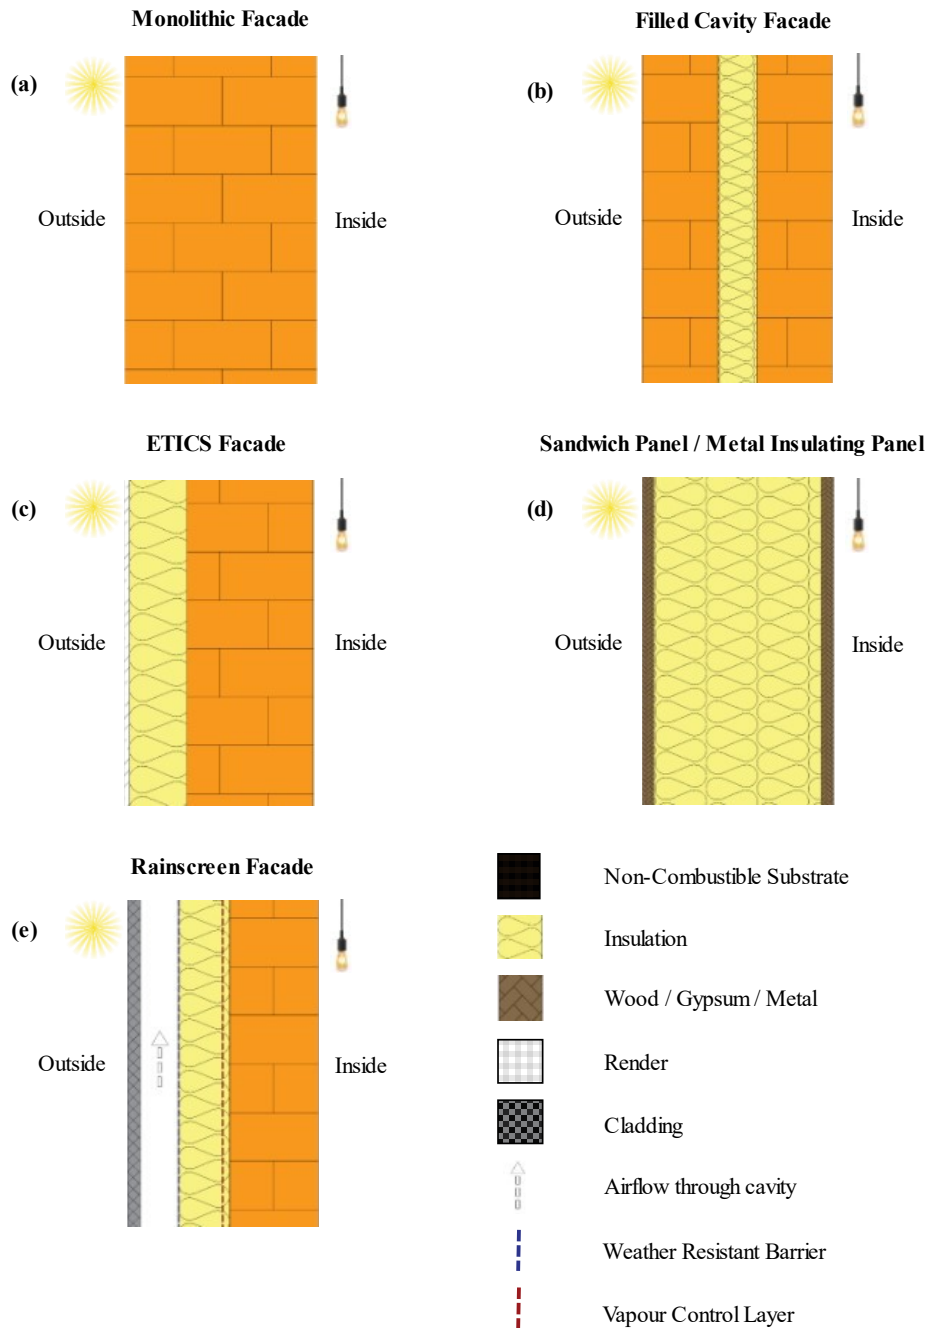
Simplified sections of common facade systems: (a) Monolithic Facade, (b) Filled Cavity Facade, (c) External Thermal Insulating Composite System (ETICS) Facade, (d) Sandwich Panel (or Metal Insulated Panel), (e) Rainscreen Facade. Note: The vapor control layer and weather resistant barrier in (e) are shown
